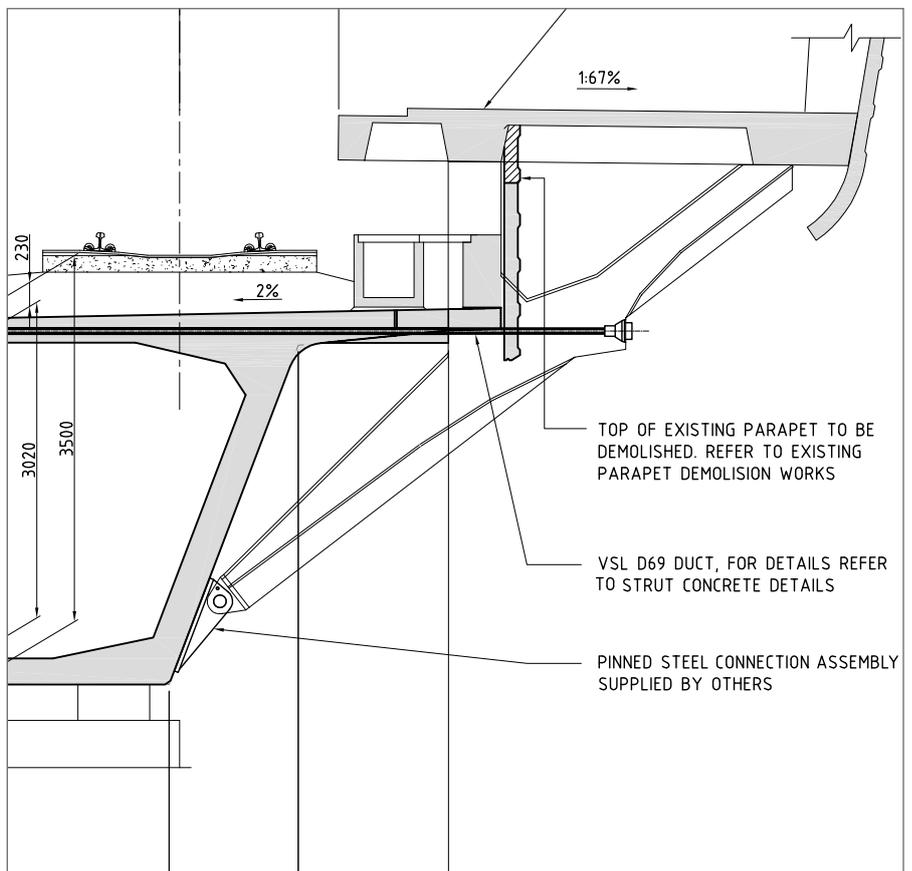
Structural system for strut connections, transverse pre-stressing and slab supports
